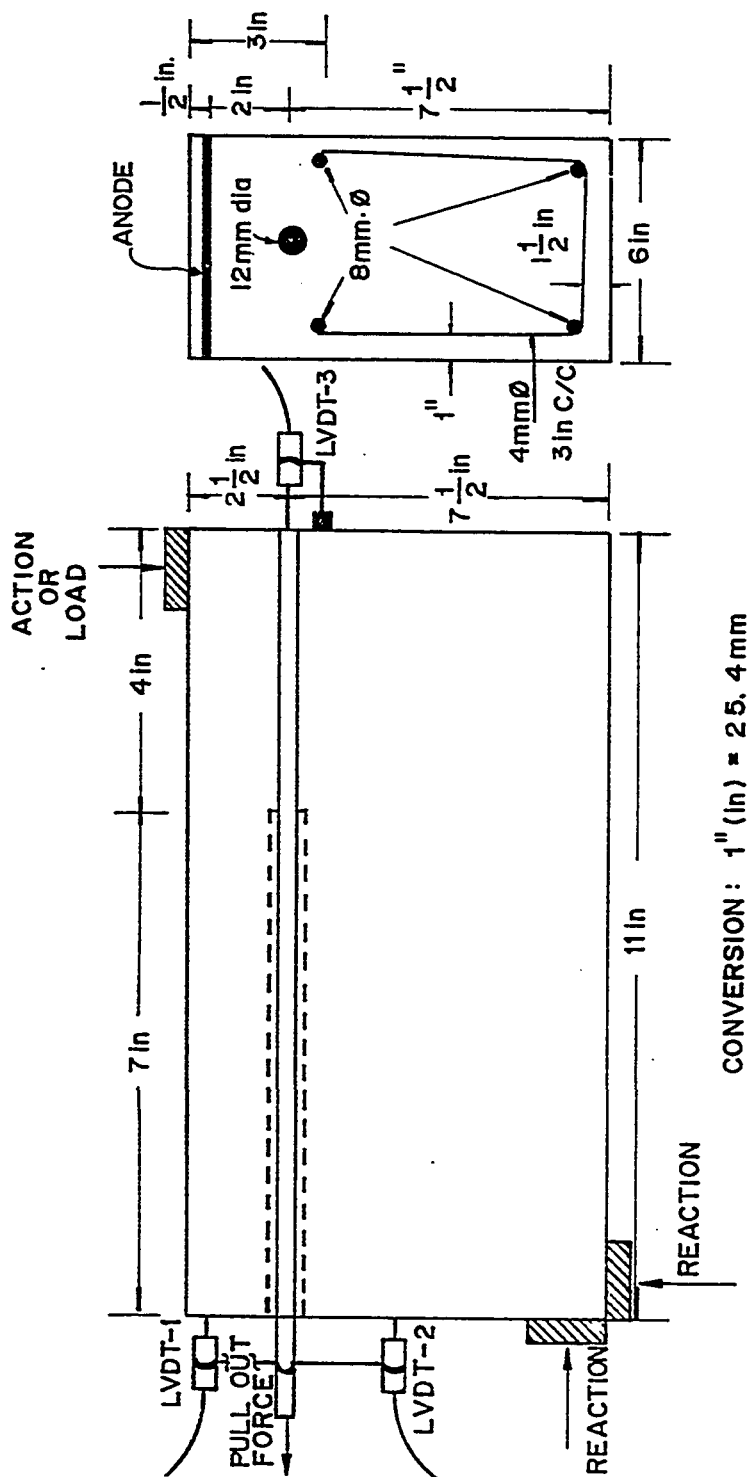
Schematic of a Typical Specimen Used in Bond Study also Showing Loading Arrangement for the Cantilever Method of Testing for Bond Strength
